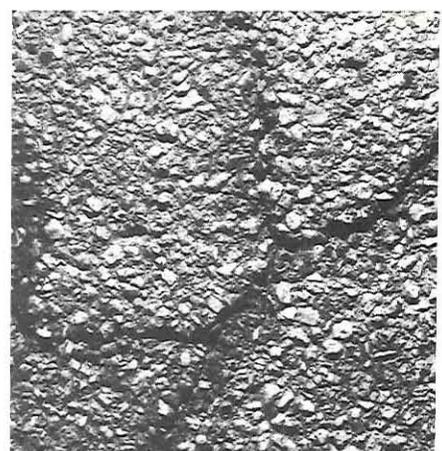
Cracks in existing seal on section 94.2 km-94.3 km of the Murray Valley Highway prior to the bitumen/rubber mix binder size 7 reseal.
